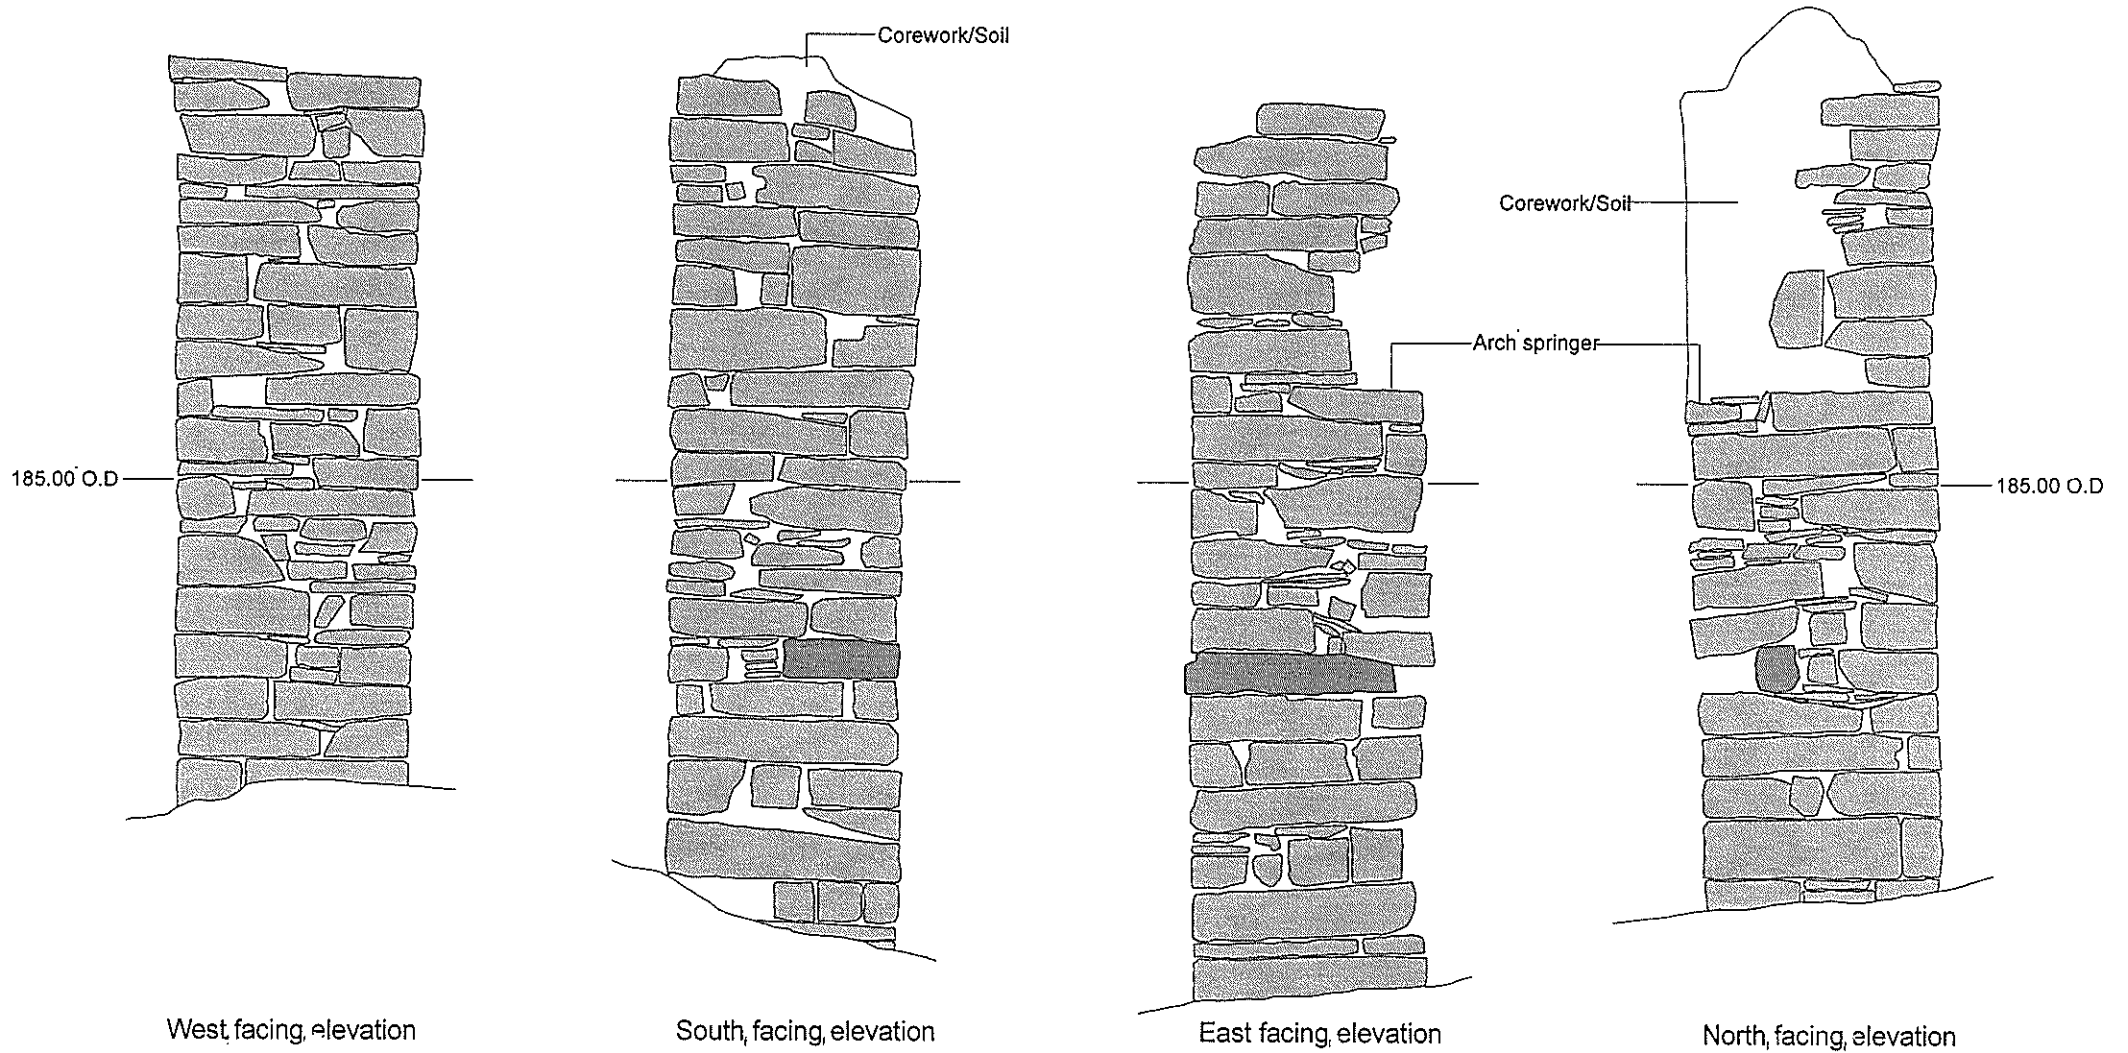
Hafod : Gothic Arcade – Northwest pier
